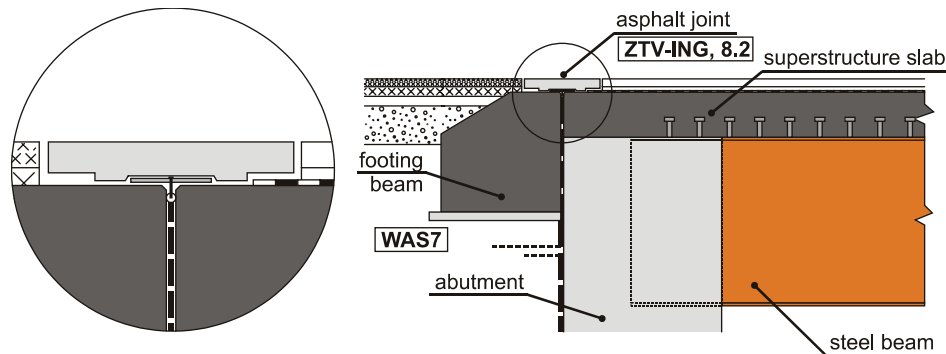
asphalt joint acc. to (ZTV-ING, 2003), ZTV-ING 8.2
